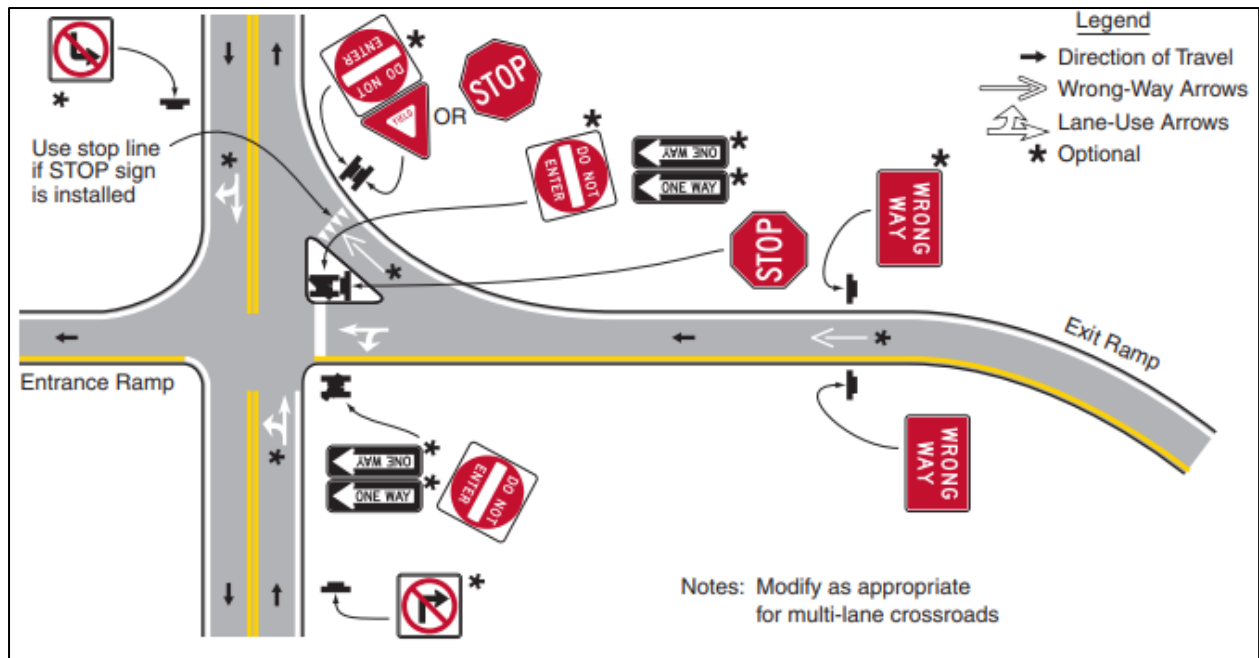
MUTCD’s Example of Application of Regulatory Signing and Pavement at an Exit Ramp Termination to Deter Wrong-Way Entry
